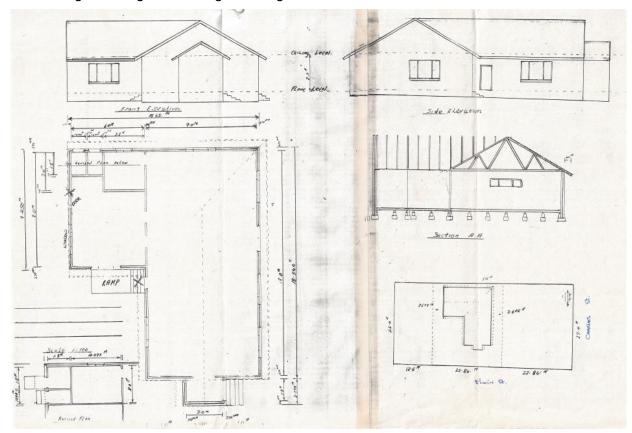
Original Drawing of the Church c1970 indicating site layout, plan and elevations for 3-5 Elwin St, Narrandera
